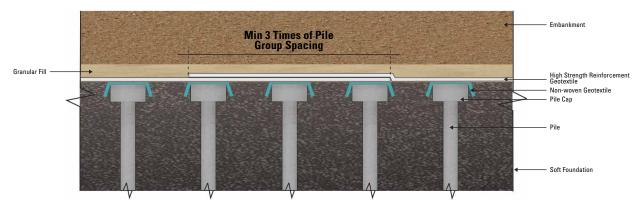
Typical overlap joint for Mirafi® high strength reinforcement geotextiles in the primary machine direction for very long embankment sections
